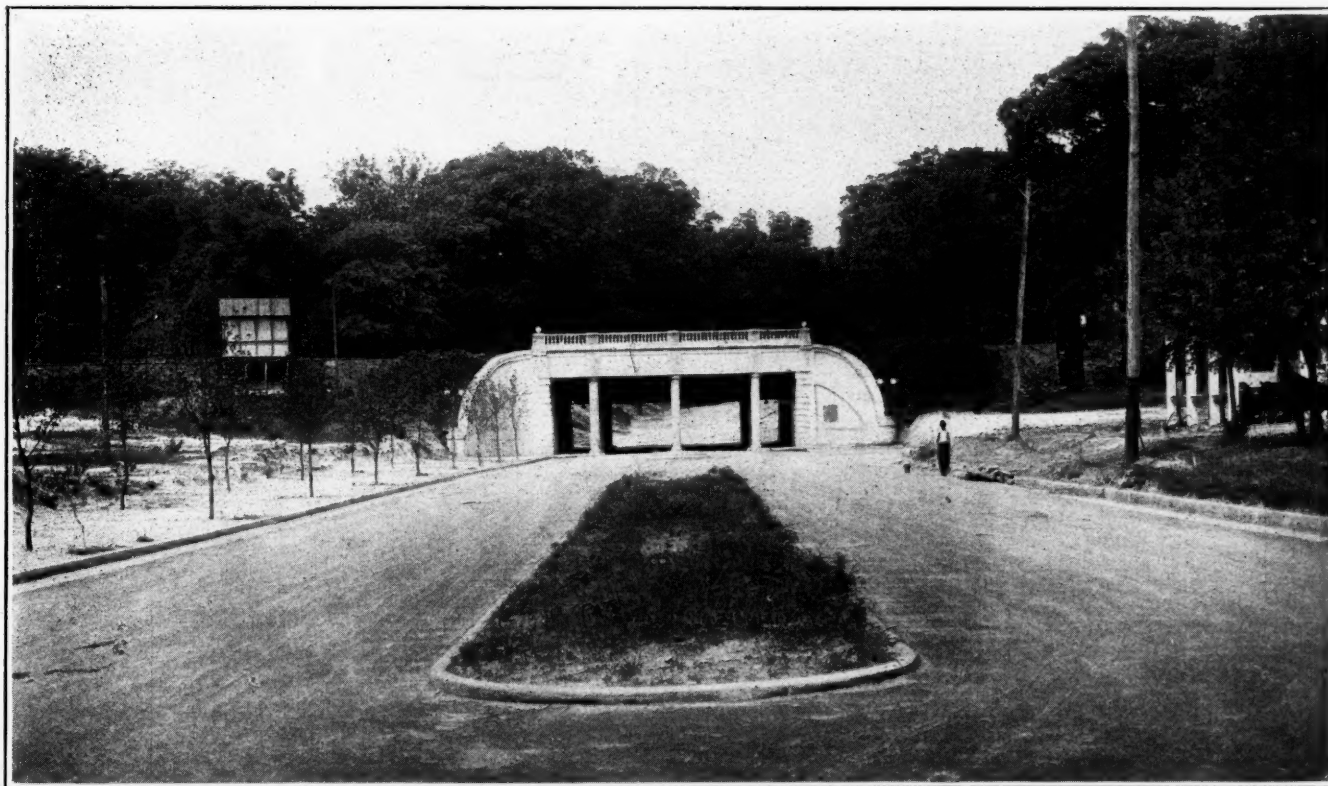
PARKSIDE AVENUE, LOOKING TOWARD OVERHEAD CROSSING.
